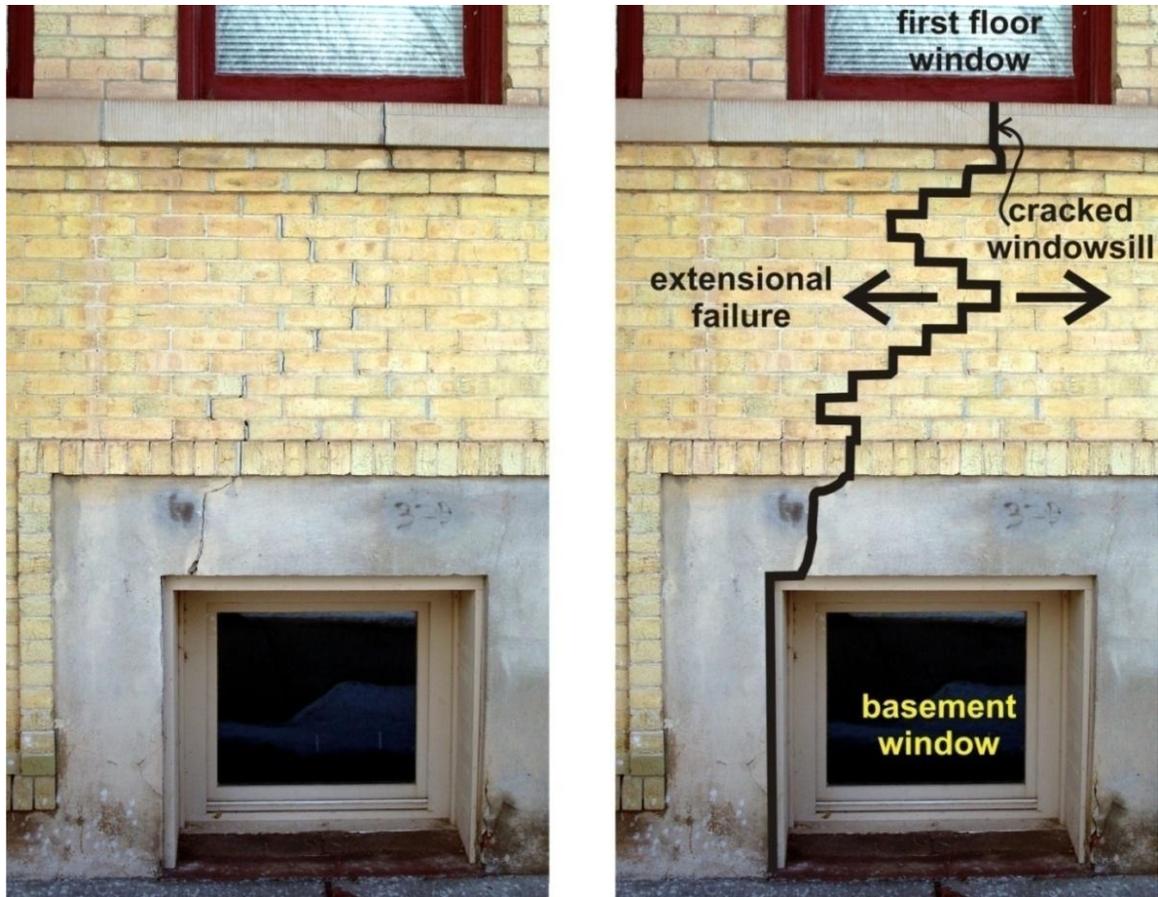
Image of the east-facing, outside wall Fruita Civic Center building. This large, two-story structure is located in downtown Fruita and was constructed in 1912 (Figure 41). This building has experienced minor damage from collapsible soils due to loading by this building. The one-story high, east-west striking, subvertical crack found in the center of this building shows down-to-the south displacement. [UTM83 12S UTMX: 696084, UTM Y: 4336928]
